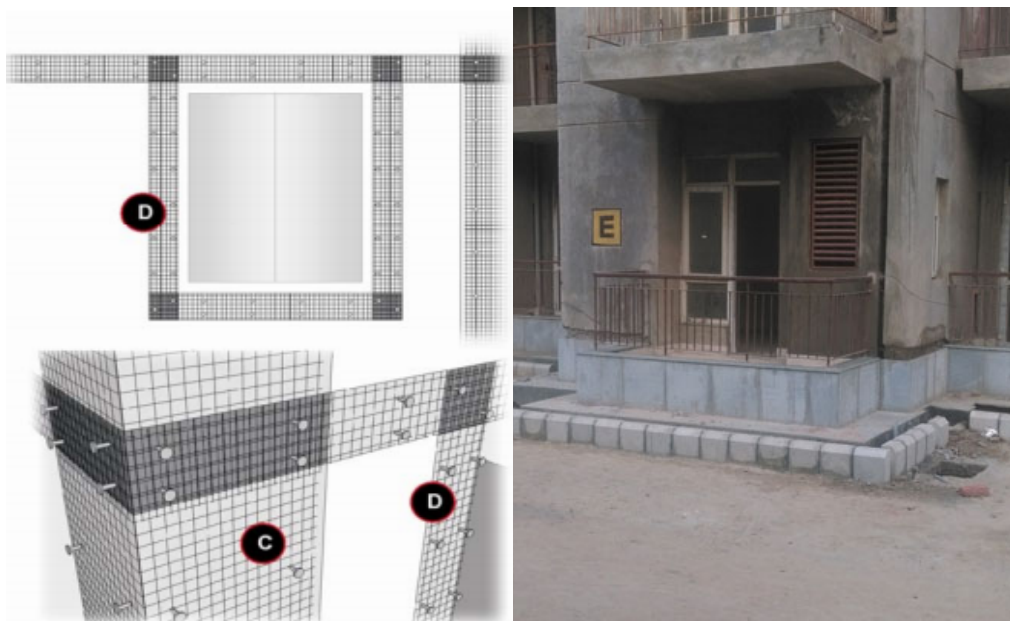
wire mesh installation for plinth protection (left) Stone plinth protection installation (right) (Credit: www.bptp.com)
